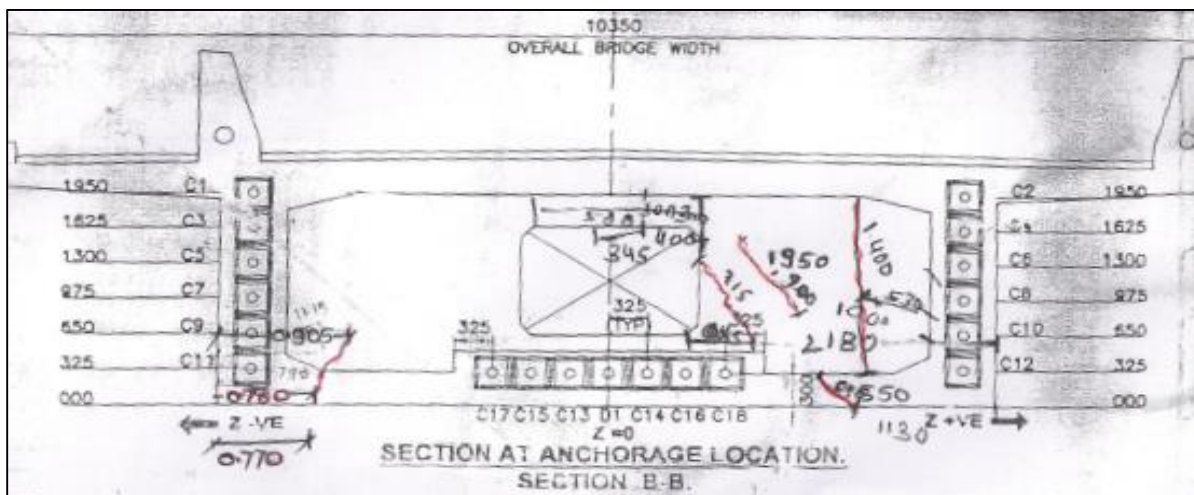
Cracks Marked in Drawing at Diaphragm Wall of Abutment Side
